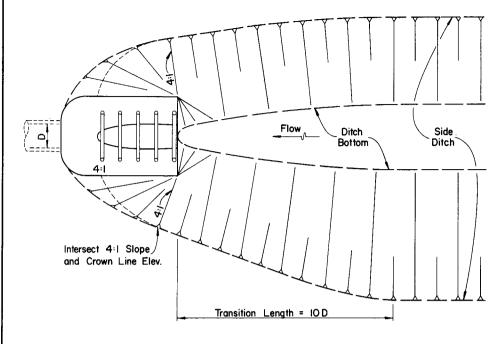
DETAILS FOR CONCRETE & CORRUGATED METAL PIPE
